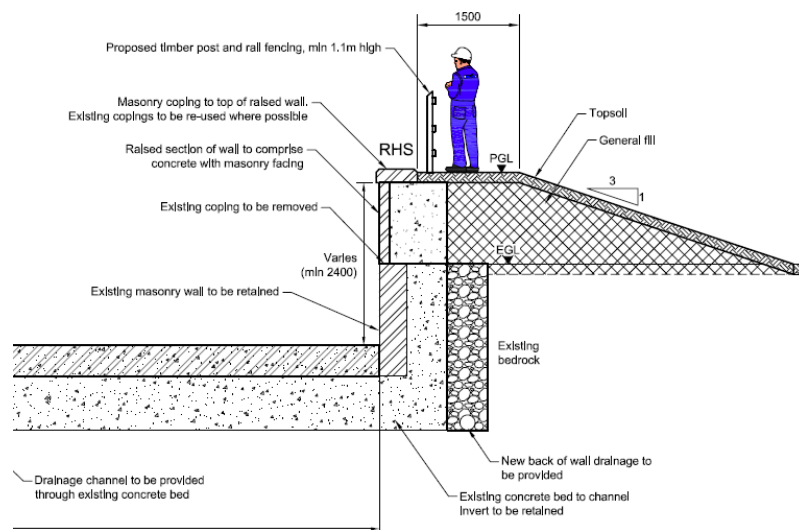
Extract from drawing PR02-07-233 (P1) Proposed new spillway RHS wall section (Planning Appeal)
